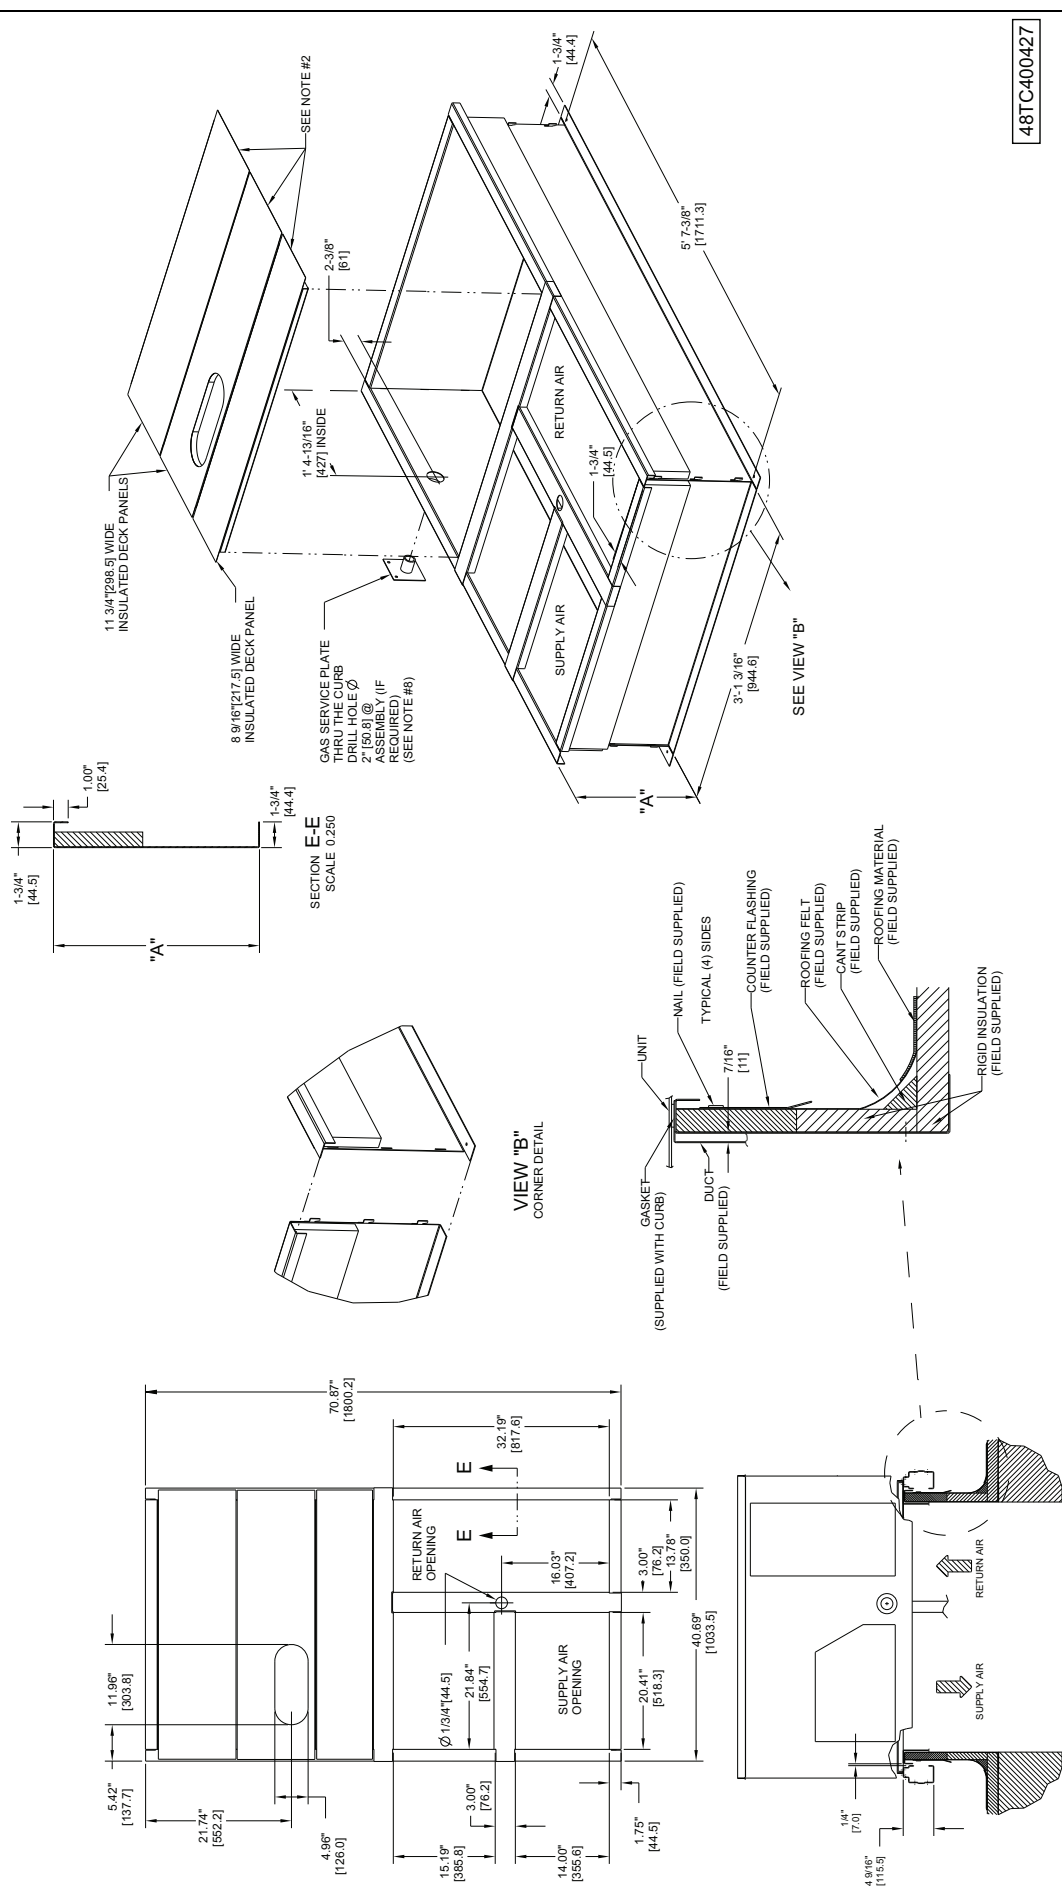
582K04-07 Roof Curb Accessory Details
